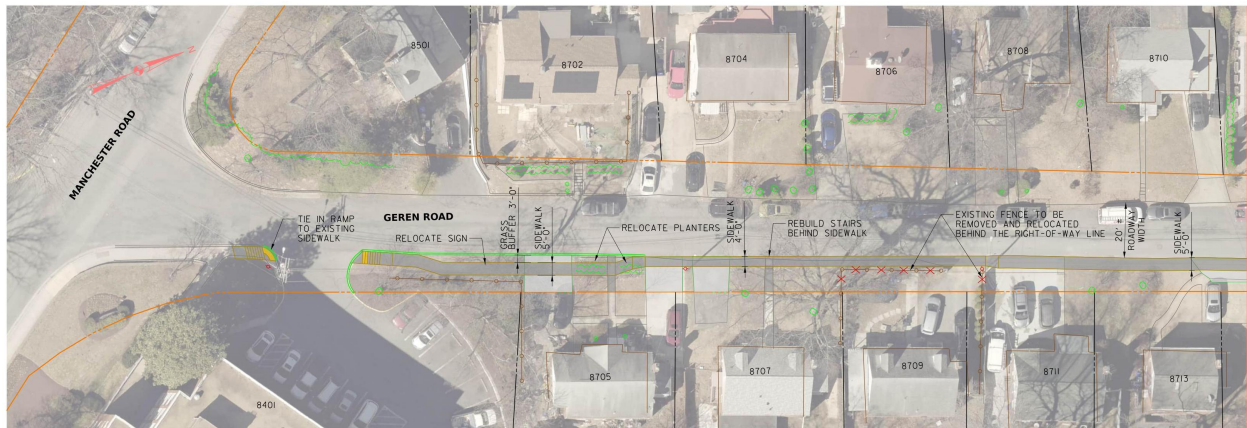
Plan view of proposed sidewalk improvements along Geren Road at Manchester Road intersection. The drawing overlays construction elements on aerial imagery, identifying a 6-inch concrete sidewalk corridor, ADA-compliant ramps tying into existing sidewalks, detectable warning surfaces at curb ramps, grass buffer (3'-0'') and sidewalk widths (5'-0''), relocated planters and sign, rebuilt stairs behind the sidewalk, existing fence to be removed and relocated behind the right-of-way line, new curb segments, retaining wall areas, and driveway connections serving adjacent residential properties (addresses 8702–8713). Orientation arrow and right-of-way boundary are shown.
